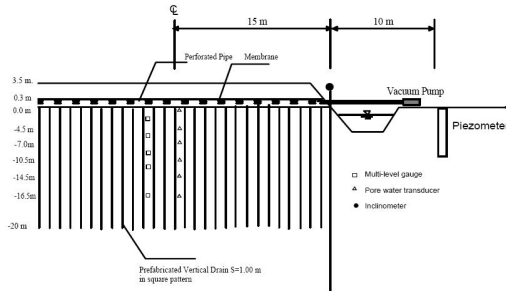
Vertical cross section A-A and locations of monitoring instruments (after Rujikiatkamjorn et al. 2007)
